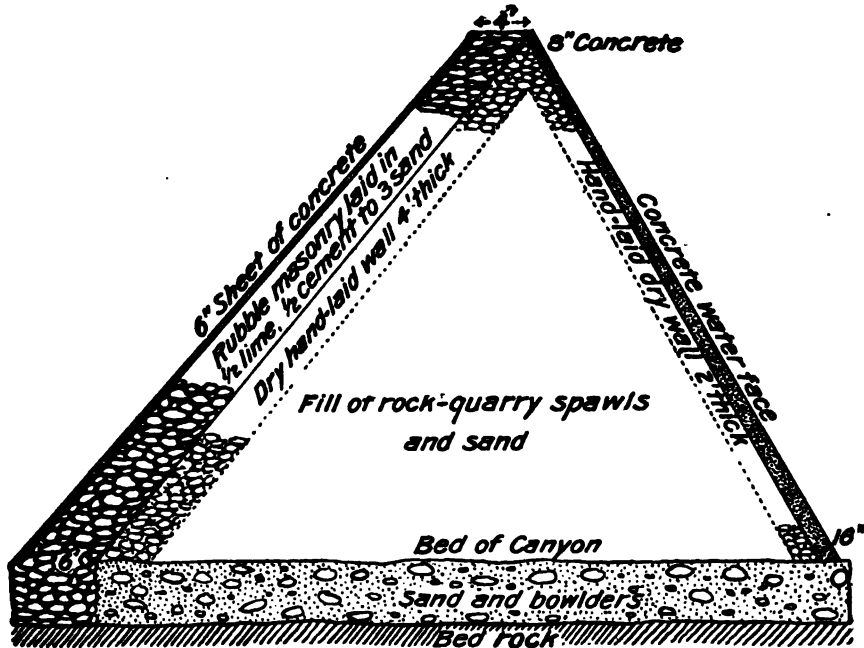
SKETCH OF RECONSTRUCTION OF CHATSWORTH PARK ROCK-FILL DAM.
